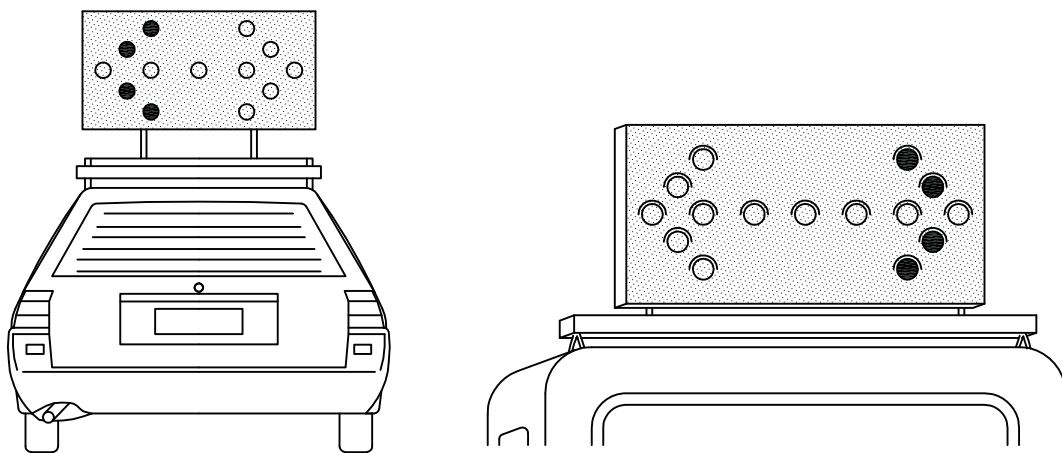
ILLUMINATED FLASHING ARROW SIGN
